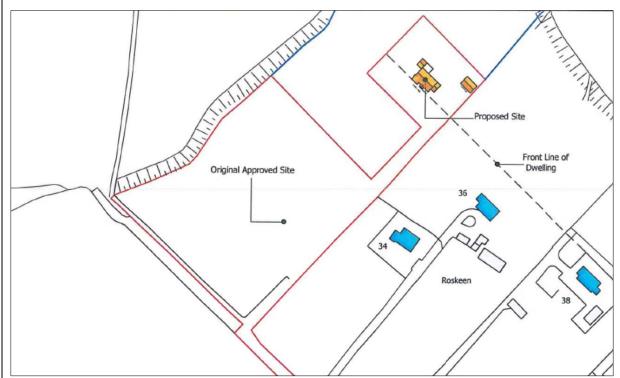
Current site location plan showing approx. location of previously approved dwelling and garage; and location of the change of house type including garage proposed.
